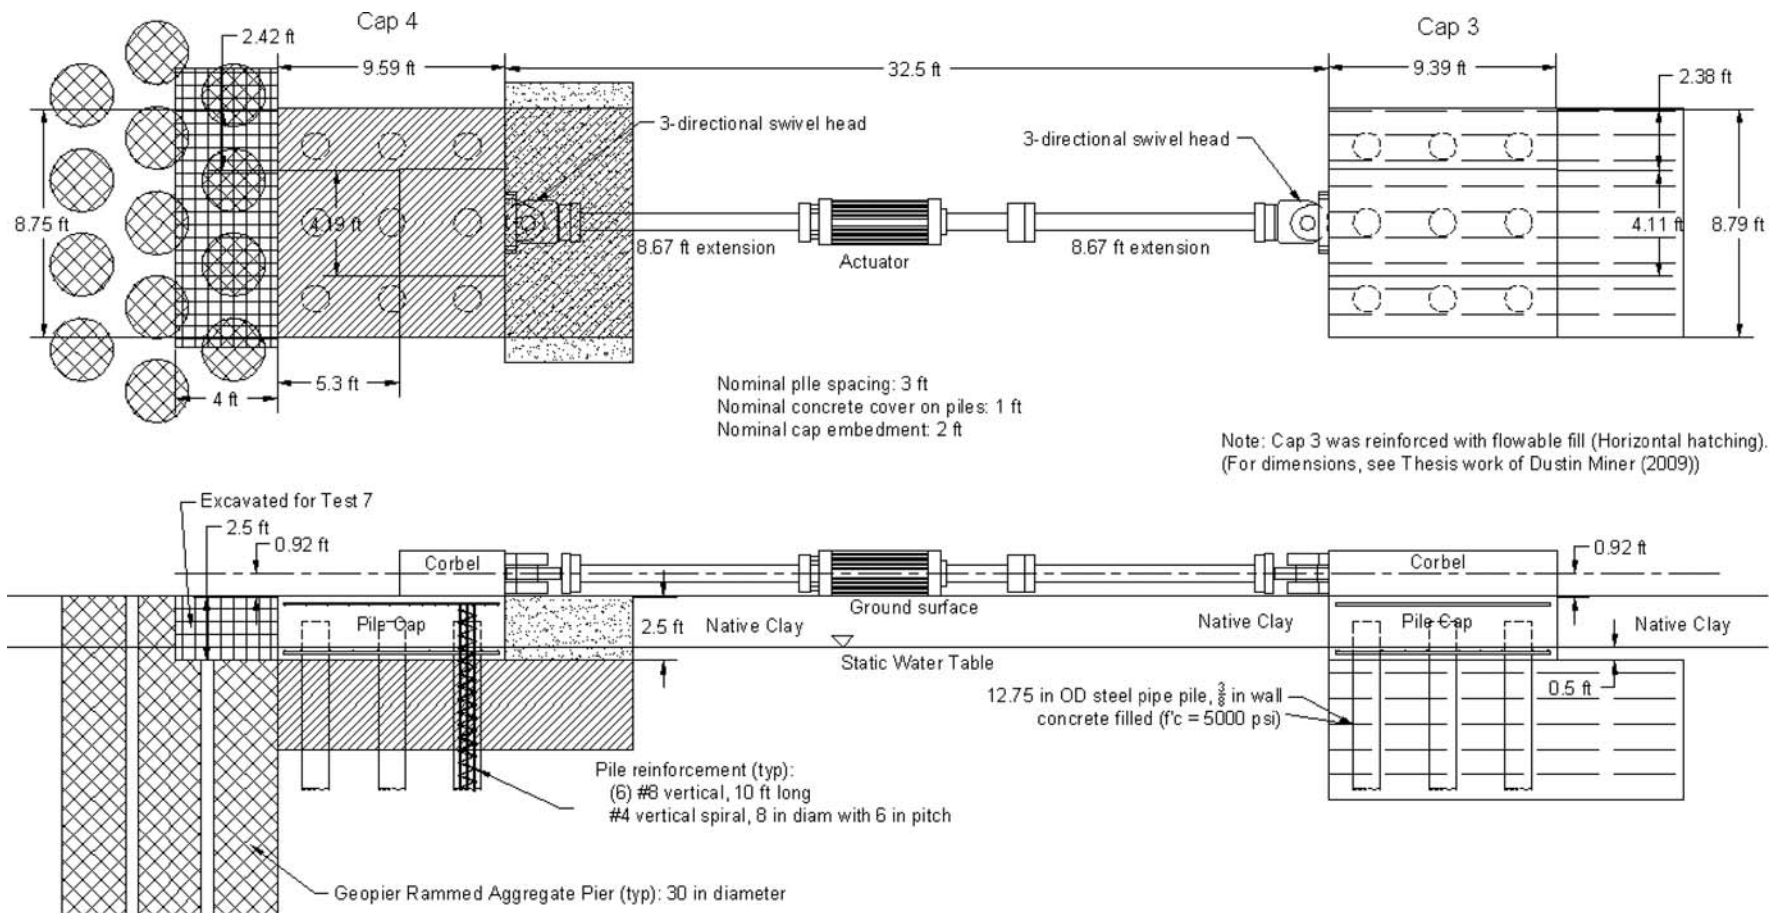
Plan and profile view of Pile Cap 4 showing the locations of the rammed aggregate piers and location of excavated zone for subsequent test.
